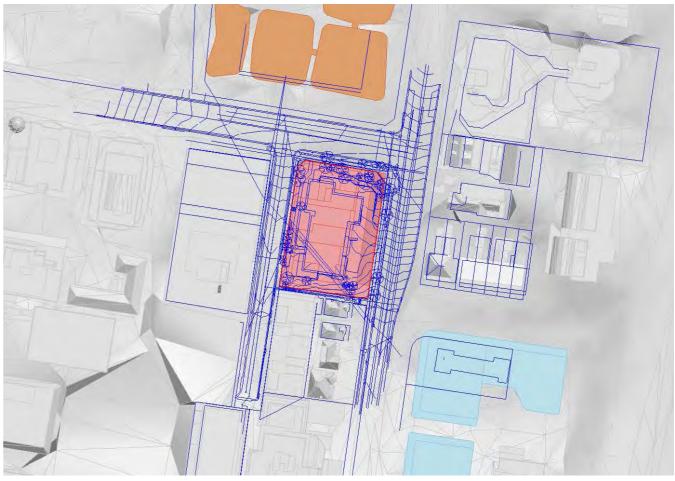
D building model aligned to survey drawing from LTS, by aligning site boundary of 45 McLaren St.
